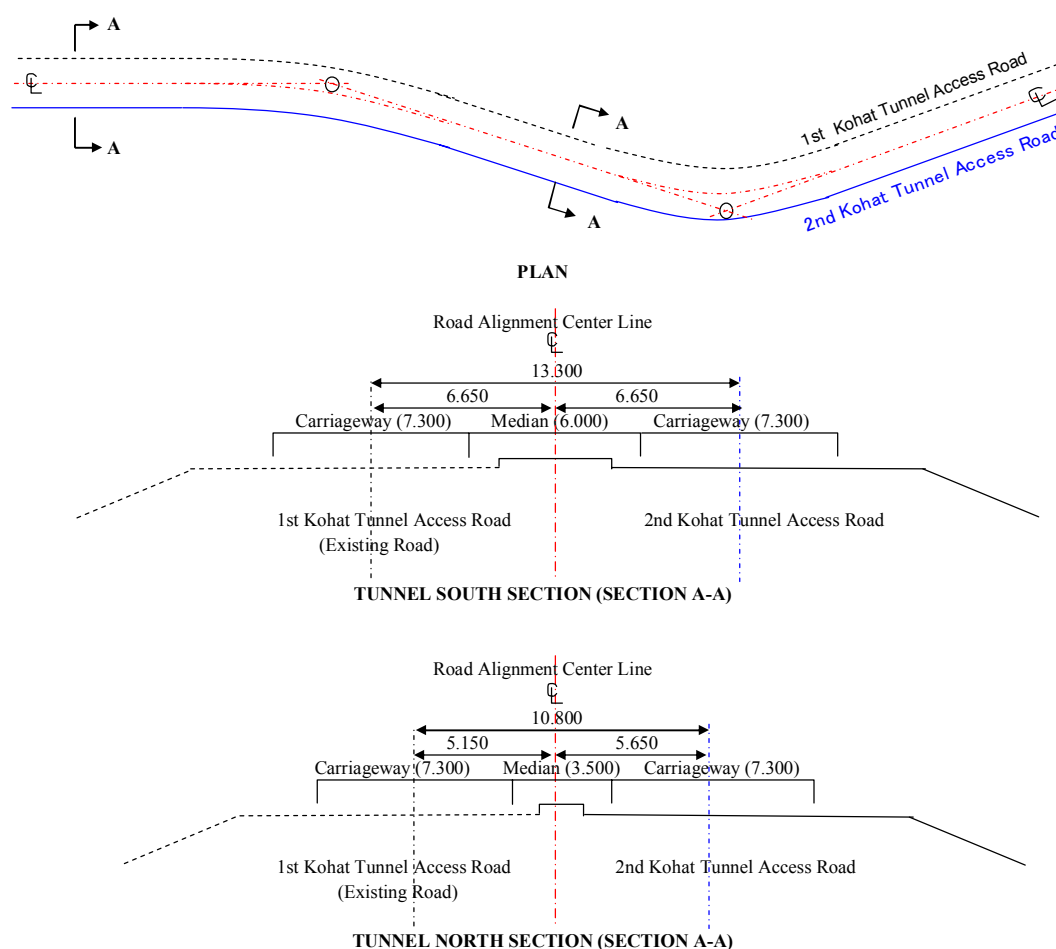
Position of the 2nd Kohat Tunnel Access Roads
